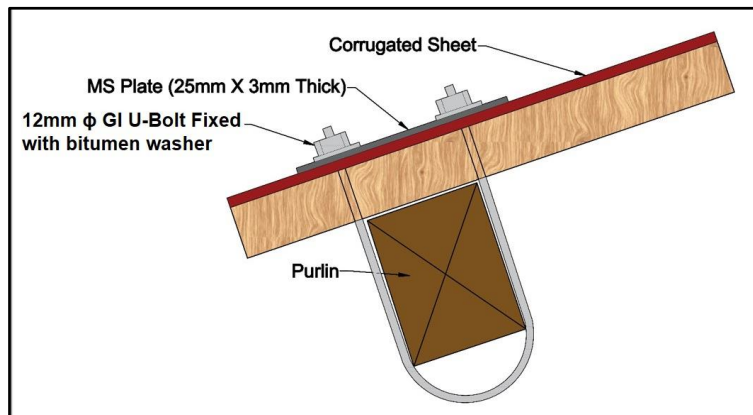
(B) FIXING OF CORRUGATED SHEET TO PURLIN WITH U BOLTS
